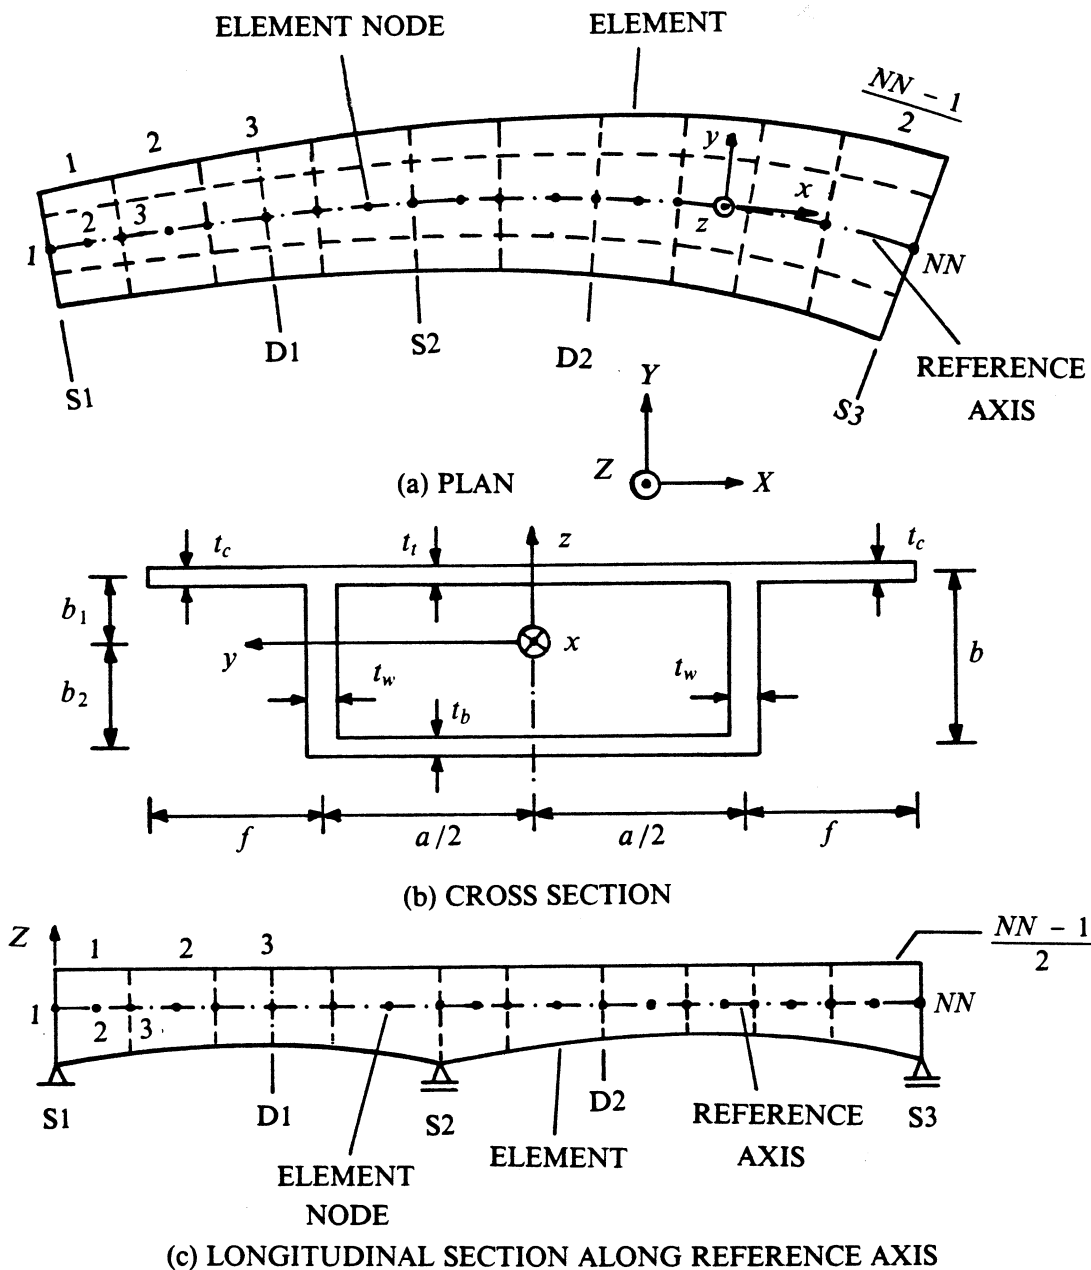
DISCRETIZATION OF TYPICAL BOX GIRDER BRIDGE INTO BOX BEAM ELEMENTS
